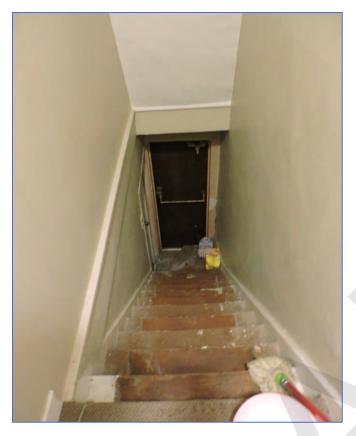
View of staircase leading from Unit 2, leading down to laundry room
